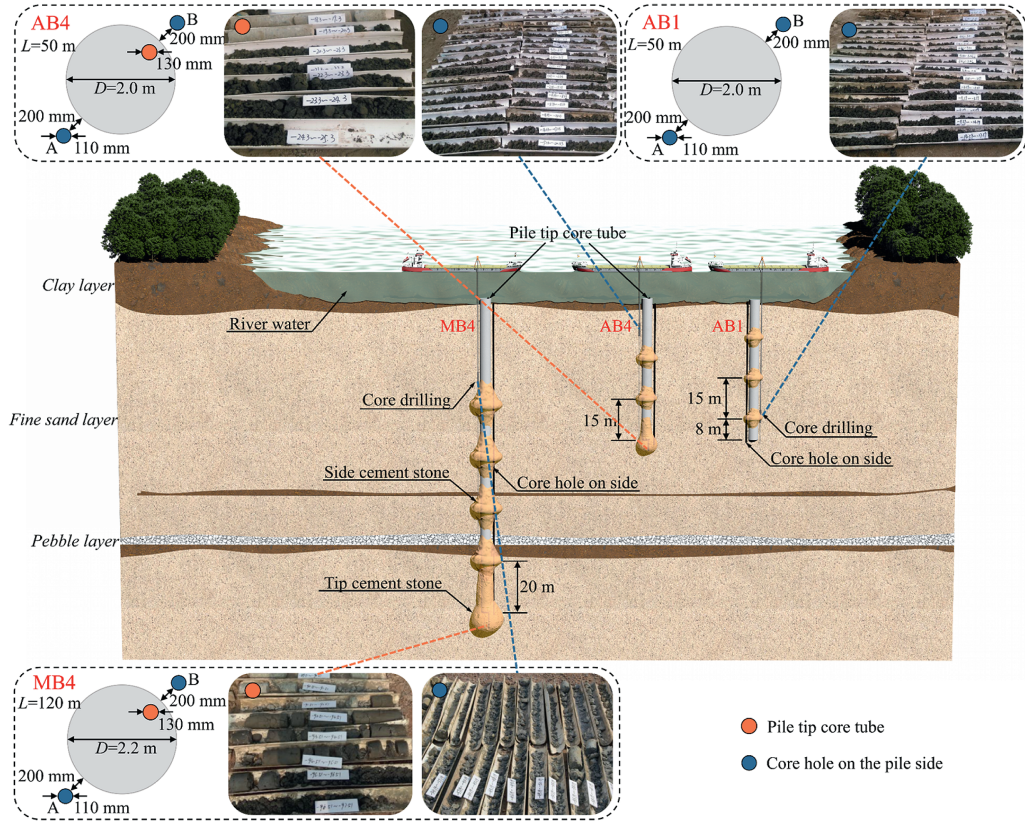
Schematic diagram of the core drilling test of the main bridge and approach bridge test piles.
